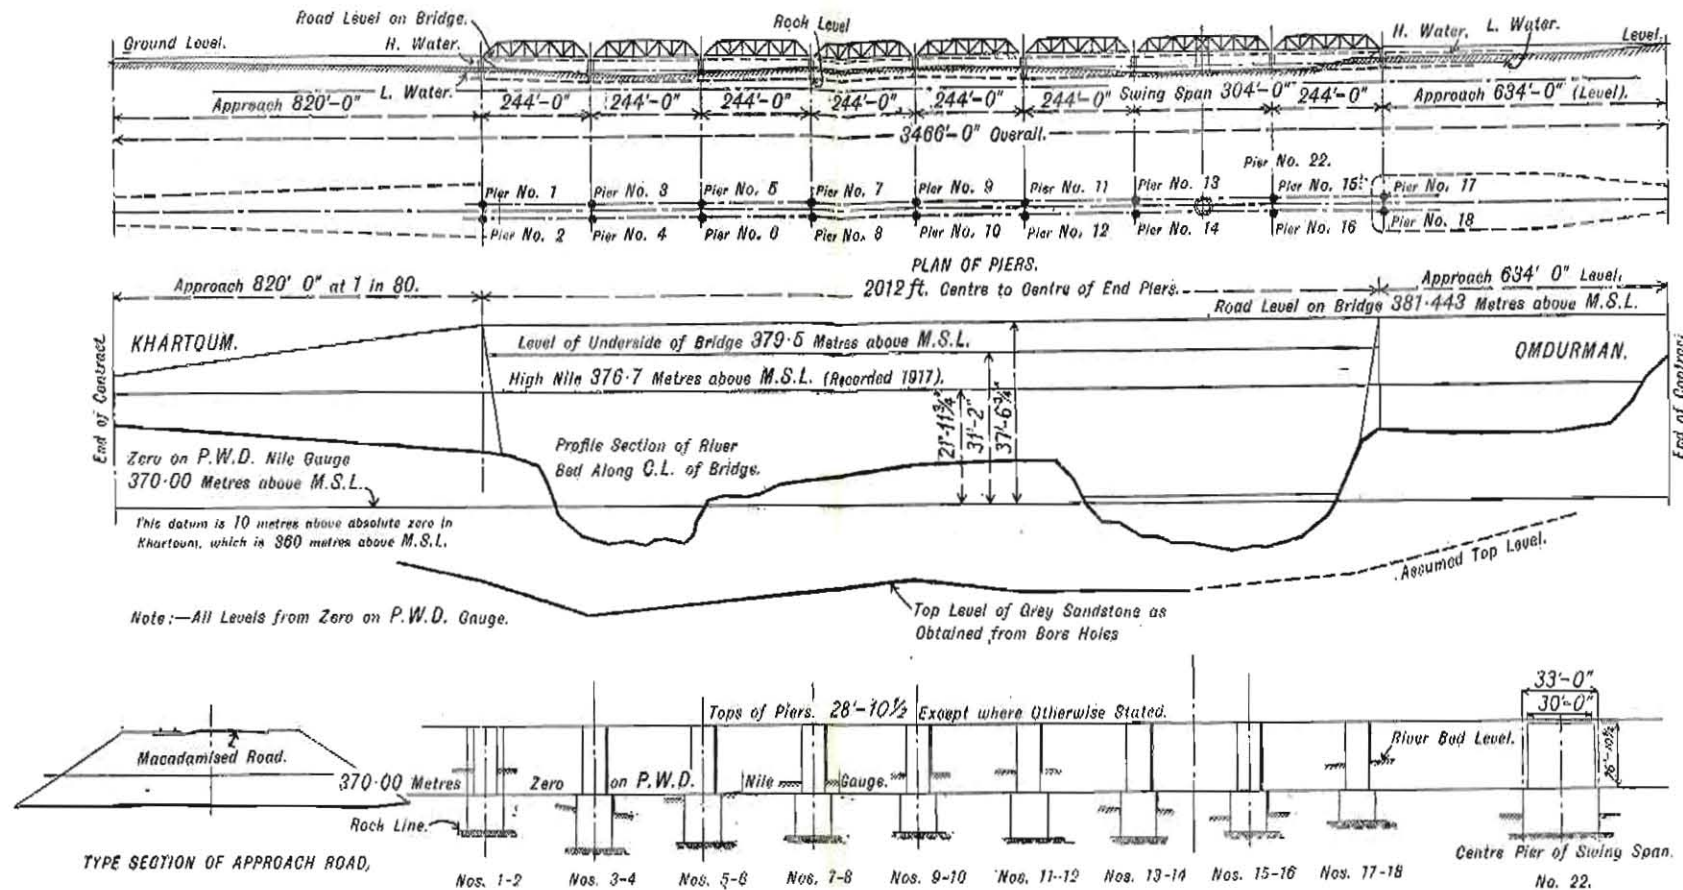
PROFILE AND PLAN OF BRIDGE SHOWING POSITIONS OF PIERS
